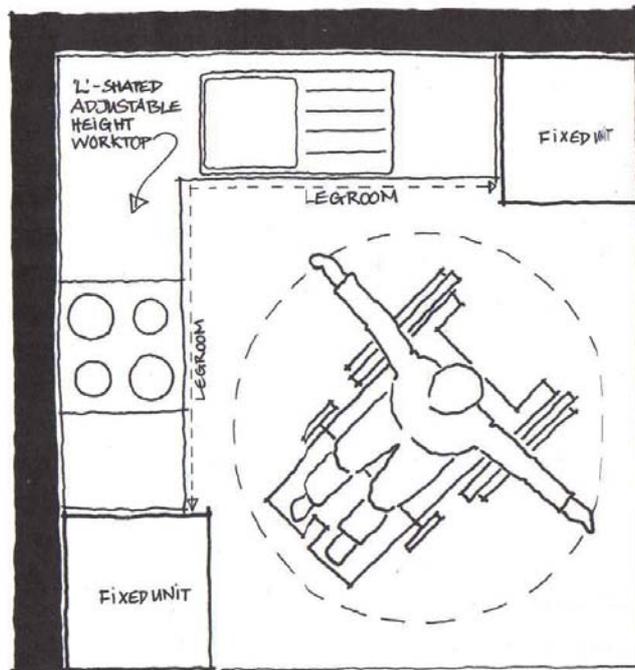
'L' shaped kitchen layout.¹³⁴
